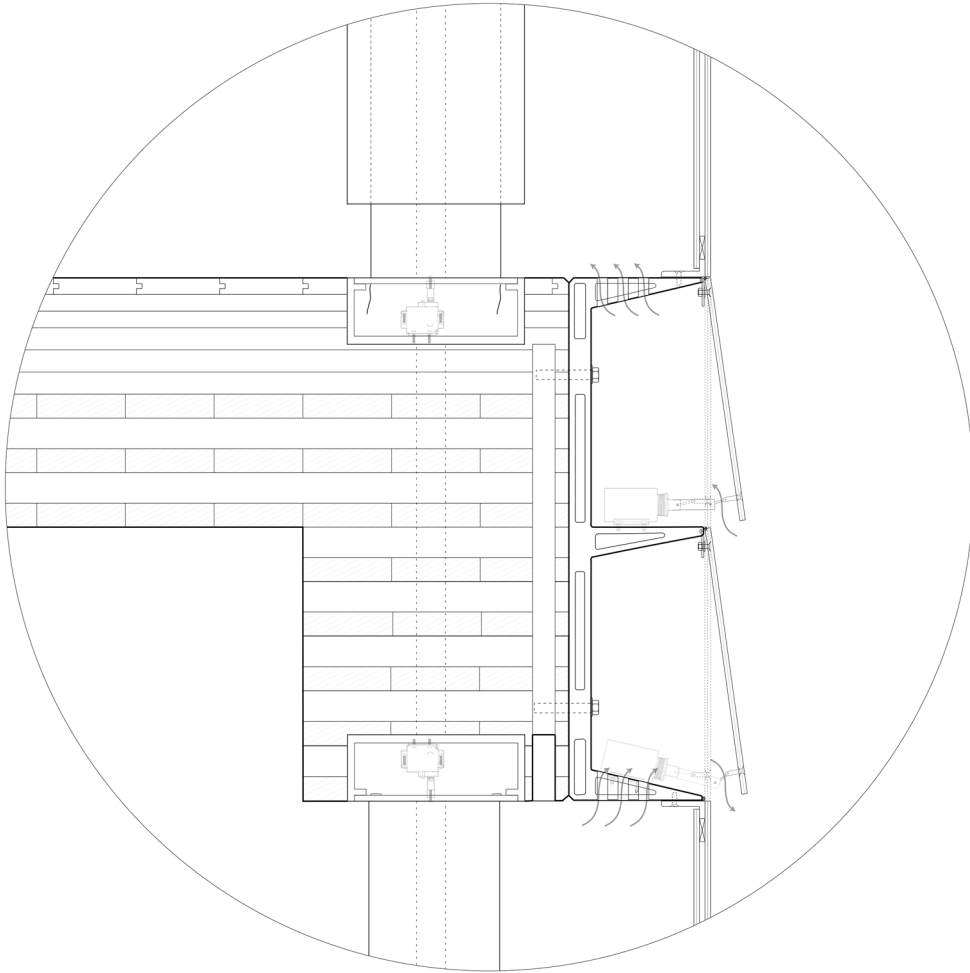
Detail Drawing of the Ventilation Extrusion with Operable Glass Panel
